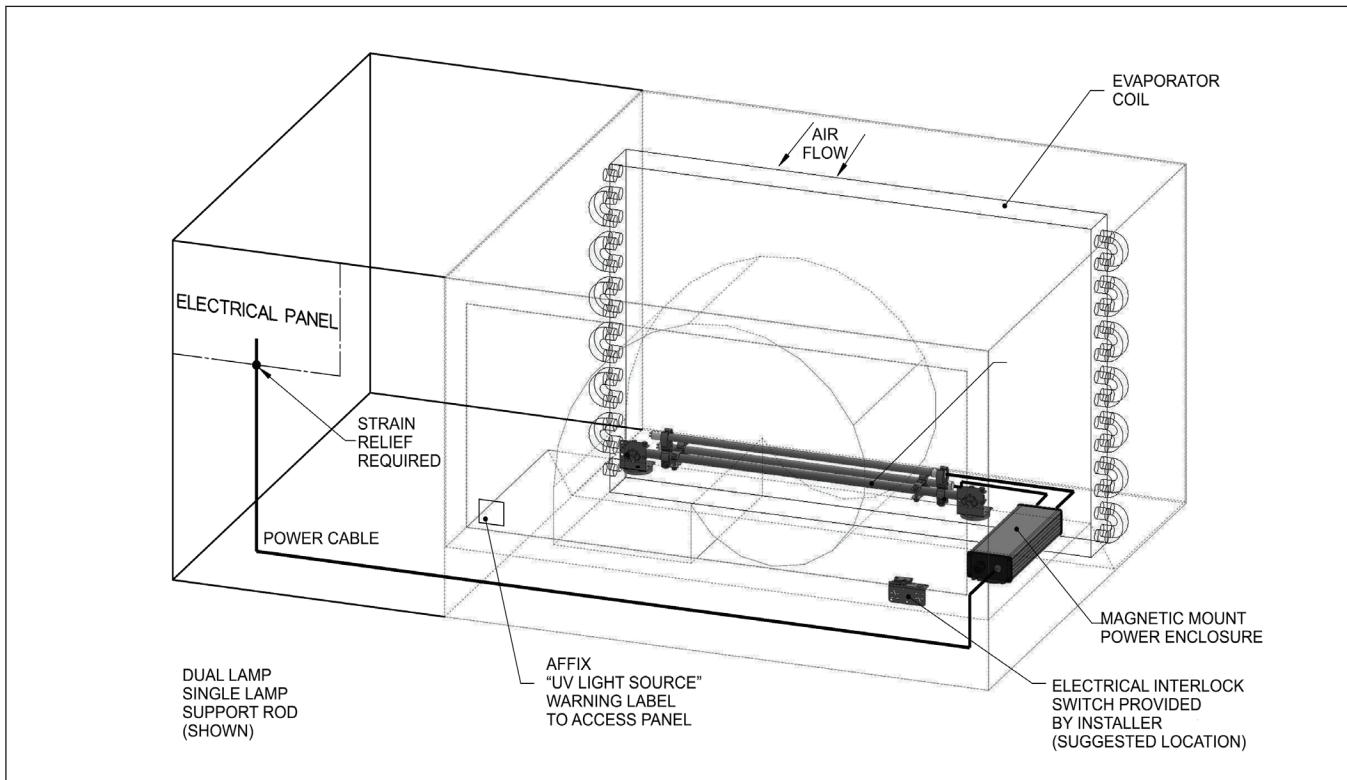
Generic Example of Rooftop HVAC Return Air Side Installation
